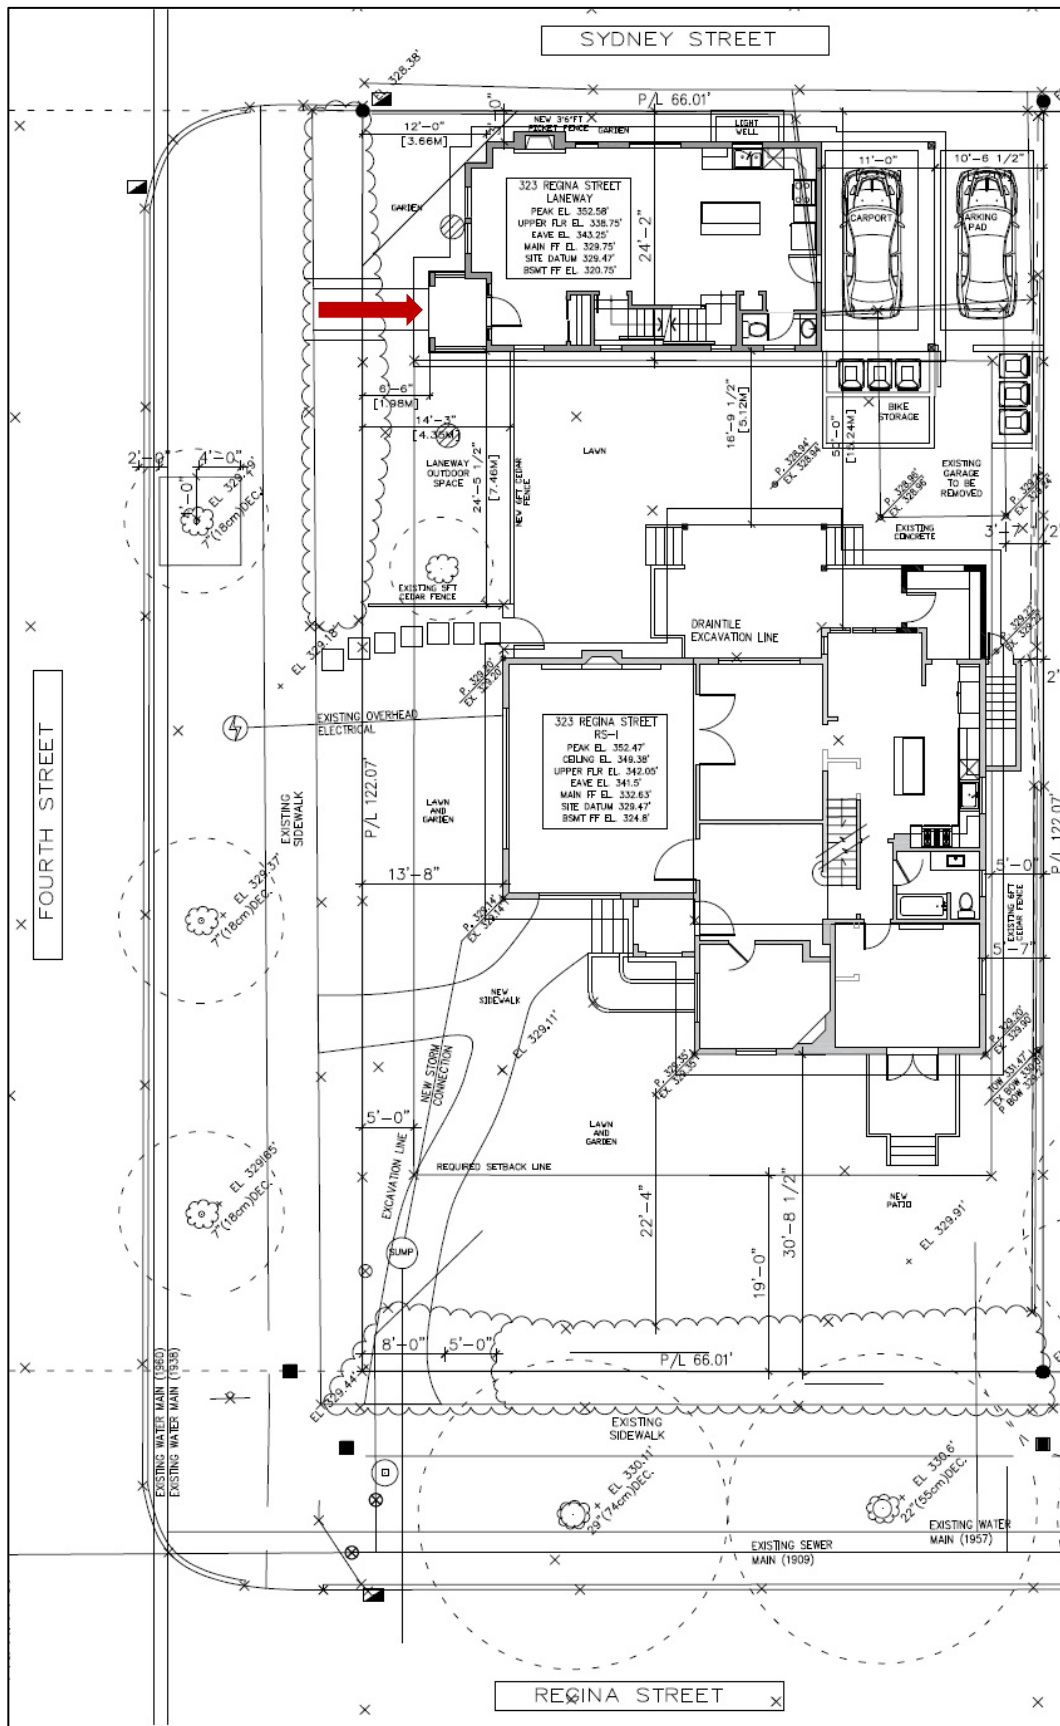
Site plan of the proposed development on the lot of Edgar House at 323 Regina Street, 2021, with the access point of the proposed laneway house pinpointed with a red arrow. (Source: Dheilly)
